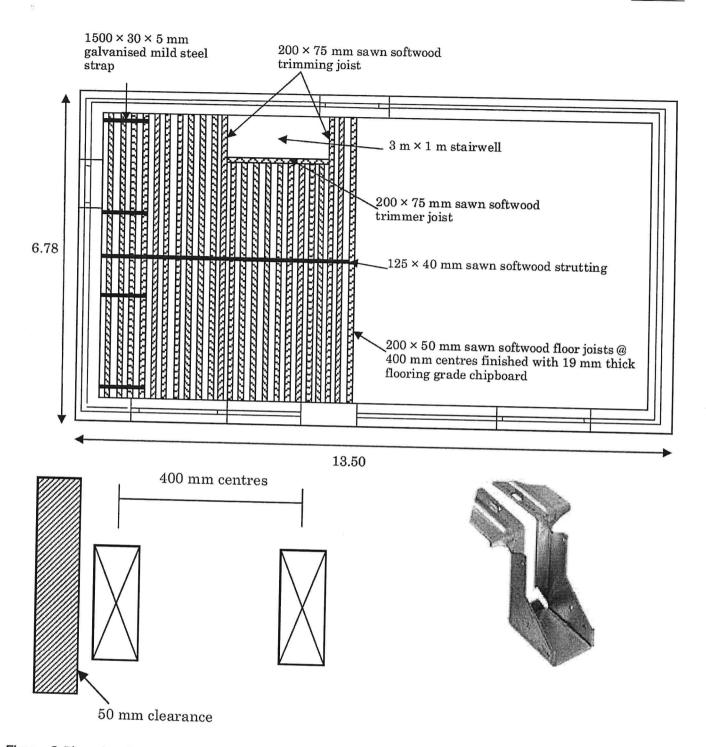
Plan showing upper floor joists layout plan, joist section detail and the type of galvanised mild steel joist hanger used.
